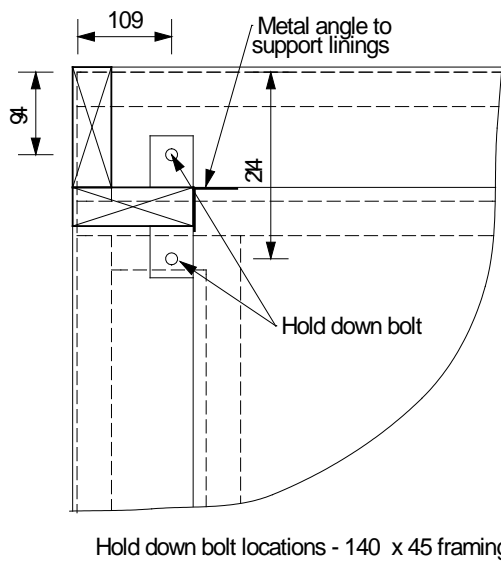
Layout of reduced 140 x 45 mm wall framing at a foundation corner showing hold-down bolt locations.
